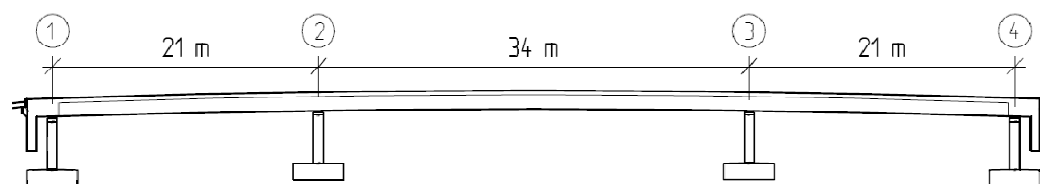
Elevation of bridge 16-935-1 at Axevalla over road 49. Adapted from Batman (2010).
